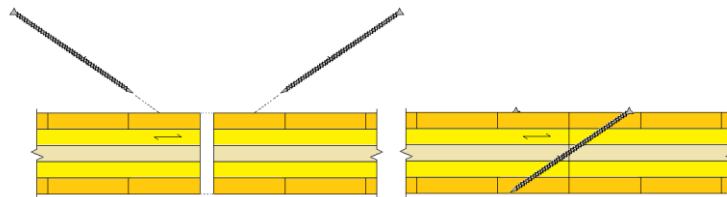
Screws driven in angle solution for aligned wall-to-wall or lateral floor-to-floor connections.
